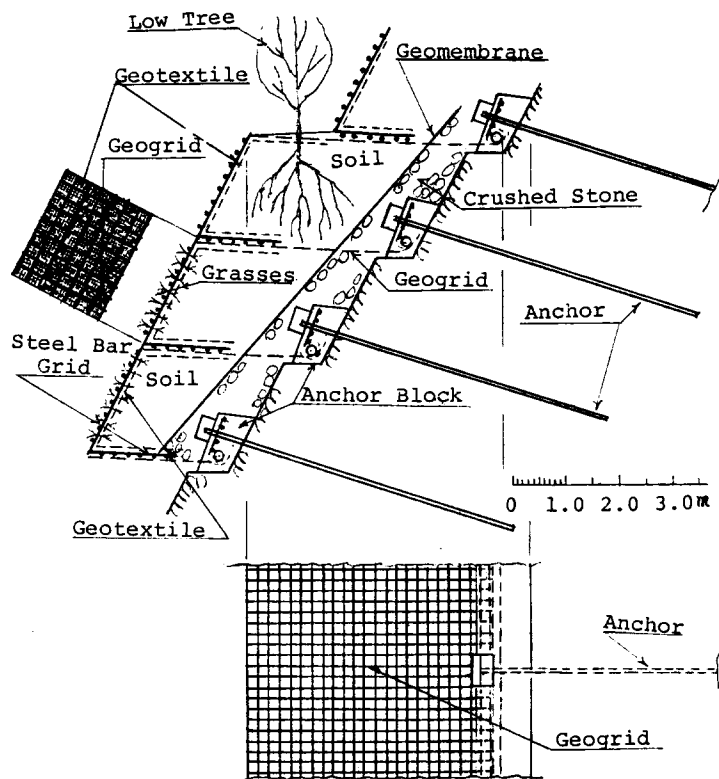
A detailed Cross Section of a Reinforced Steep and High Fill Slope
